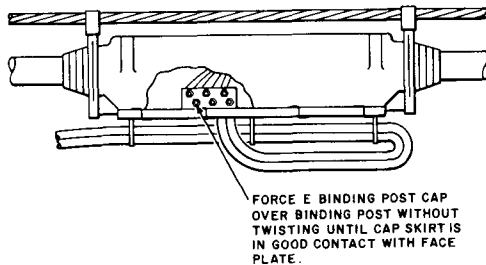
E Binding Post Caps Placed in 49-Type Cable Terminal
